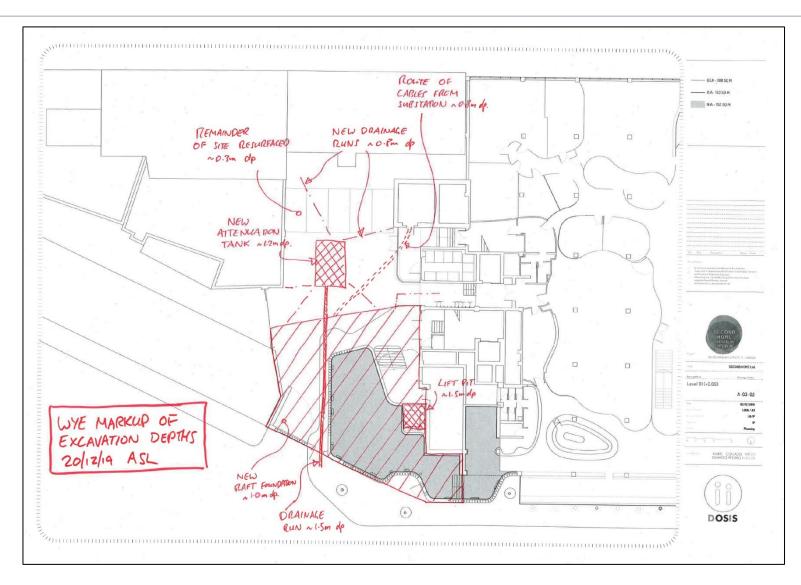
Sketch Plan showing approximate location and depths of excavations for foundations and drainage works (Reproduced by courtesy of Second Home)
